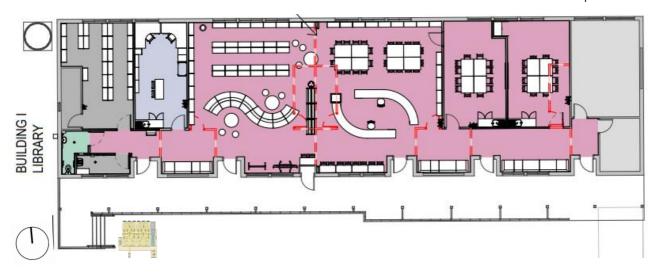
Proposed Ground Floor Plan (Source: Pedavoli Architects)
